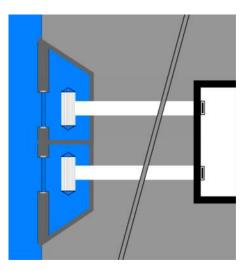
Alternative Intake Screen Pipeline Layouts
